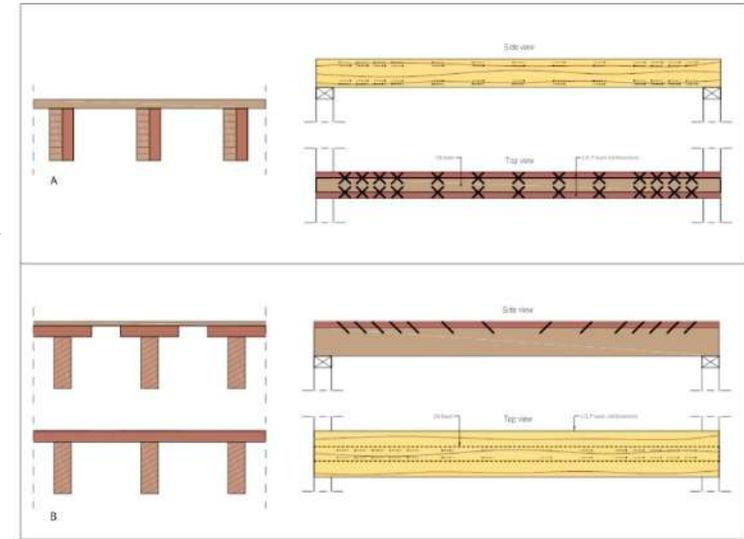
A) LVL-P reinforcement members connected with inclined screws to the sides of an existing joists, B) LVL-C panel reinforcement connected with inclined screws on the top of an existing joists.
